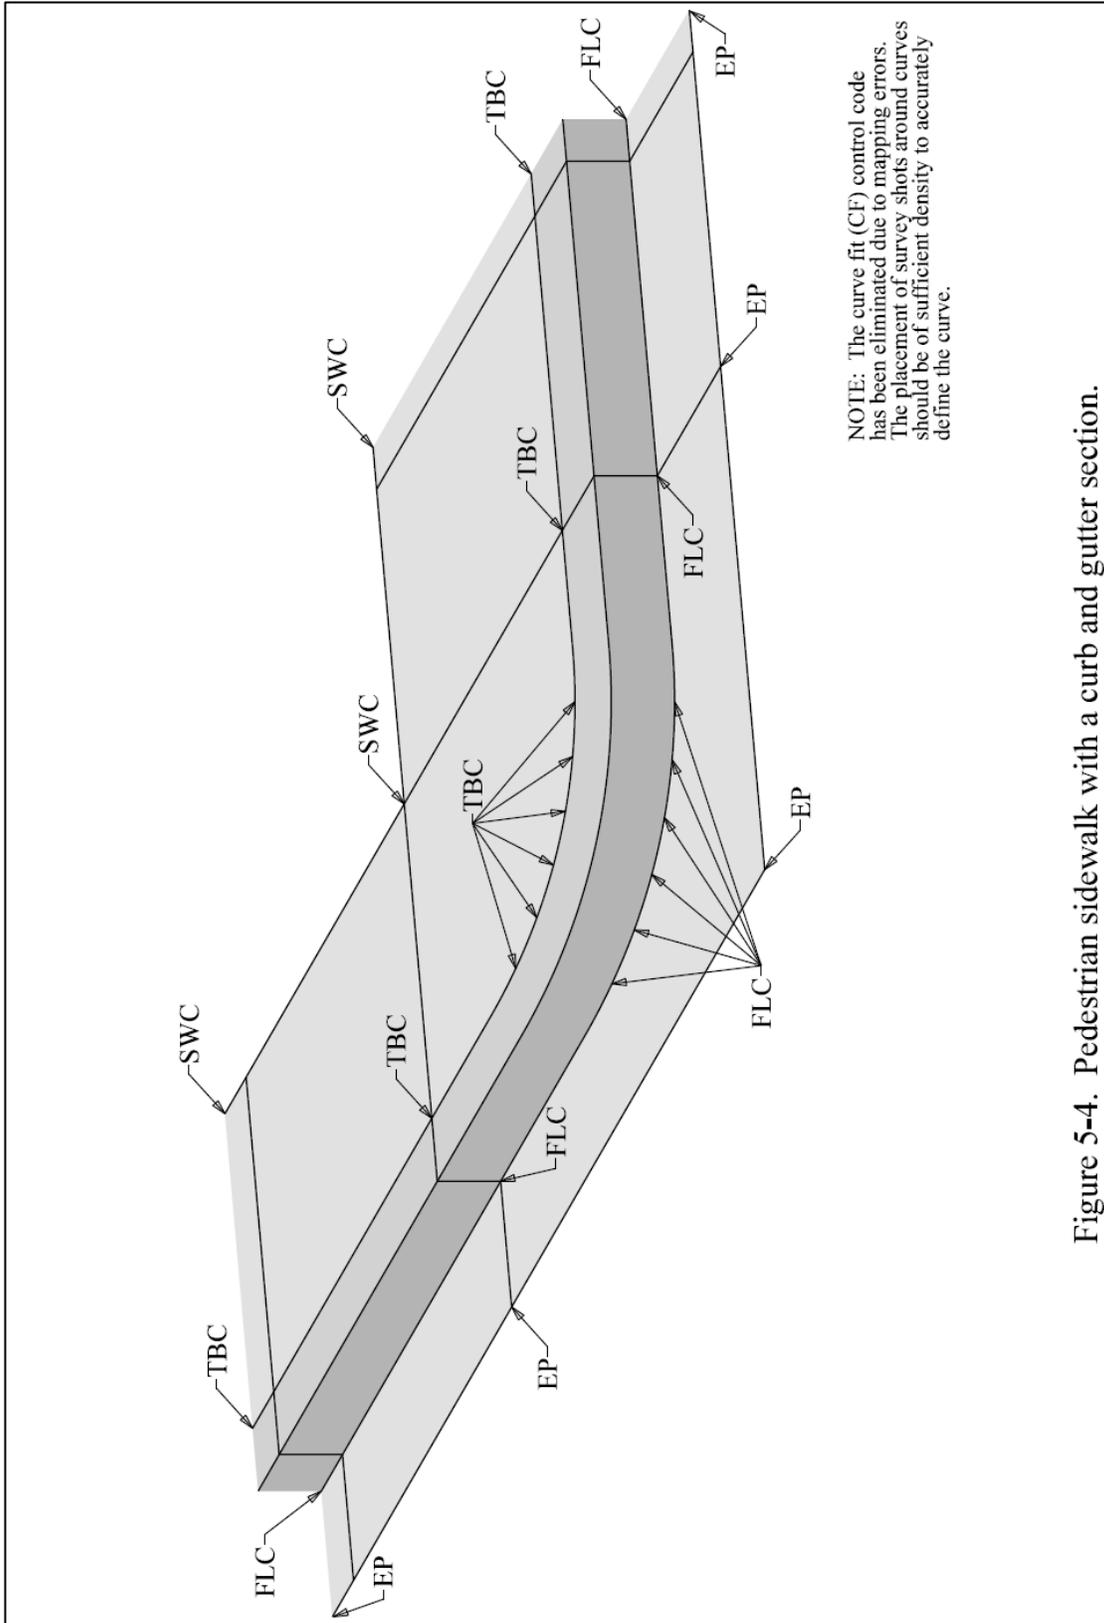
Pedestrian sidewalk with a curb and gutter section.
